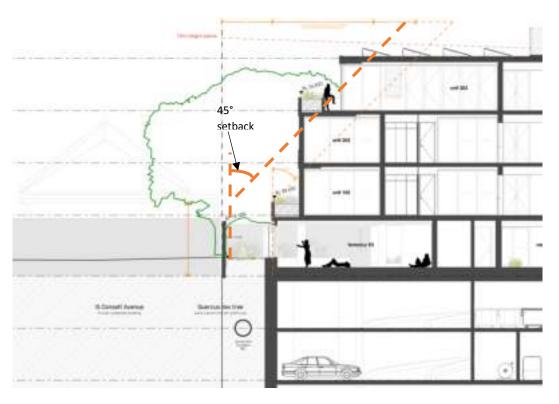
Proposed section plan showing projection of Levels 2 and 3 rear building line beyond the building envelope control in Annexure E3-3 under Part E of the Waverley DCP 2012 (Source: Bang Architecture)
